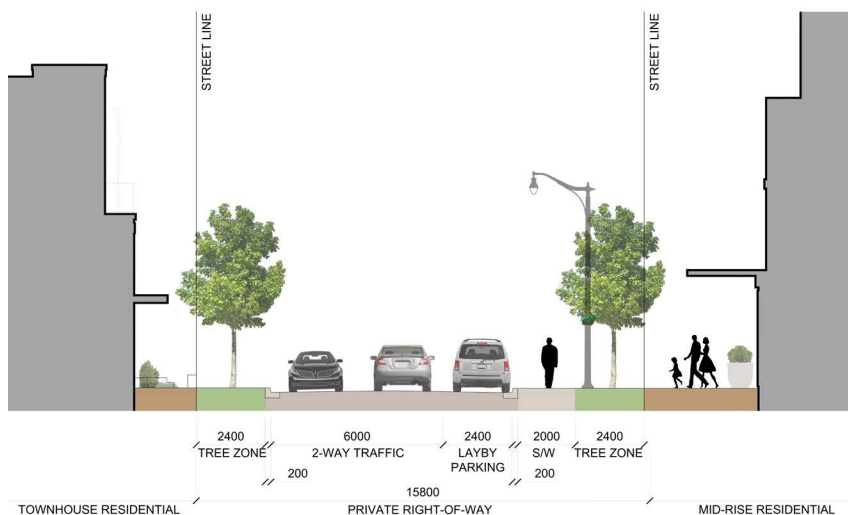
15.6m Private Condominium Driveway With On-Street Parking
